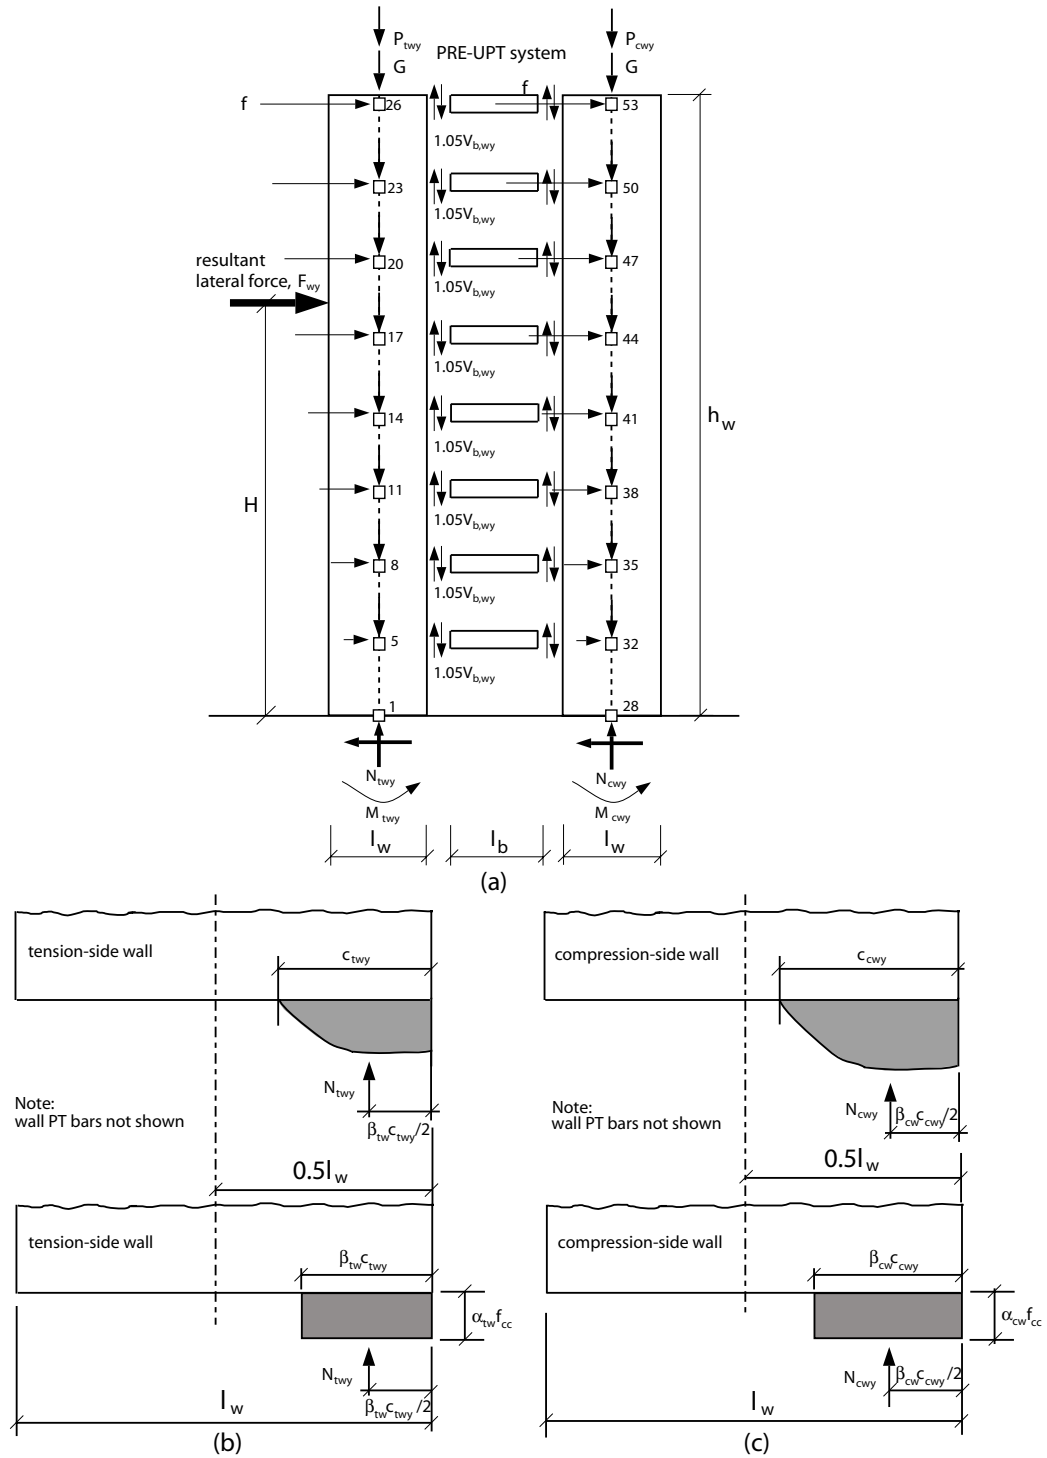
Coupled wall PT-yielding state for systems with precast concrete walls:
